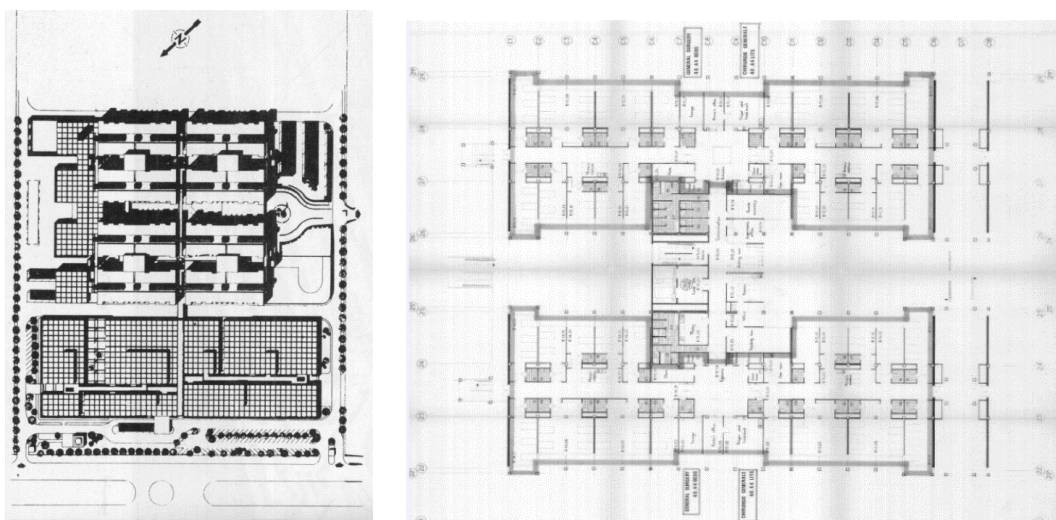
shows plans of the floor plan for the patient rooms and the general location of Ain Shams Specialized Hospital.
